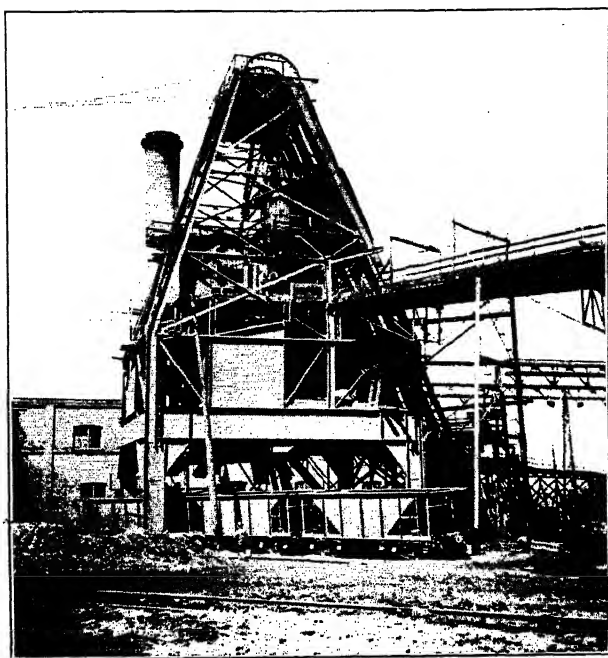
GENERAL VIEW OF *D* SHAFT.
